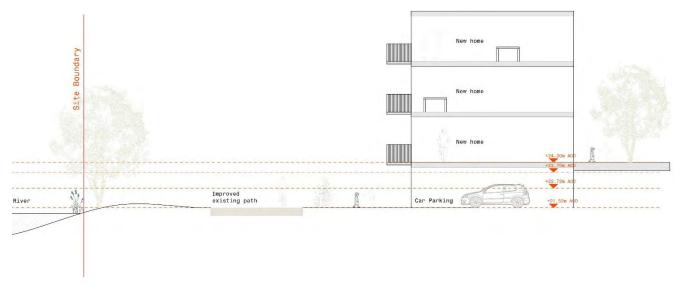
Illustrative section of the river park with a residential building fronting the river. The location of the car park on the ground floor and the new dwelling on the first floor upwards reflects the current masterplan assumptions and highlights the risk of delivering large portions of blank and inactive facades with the new development.
